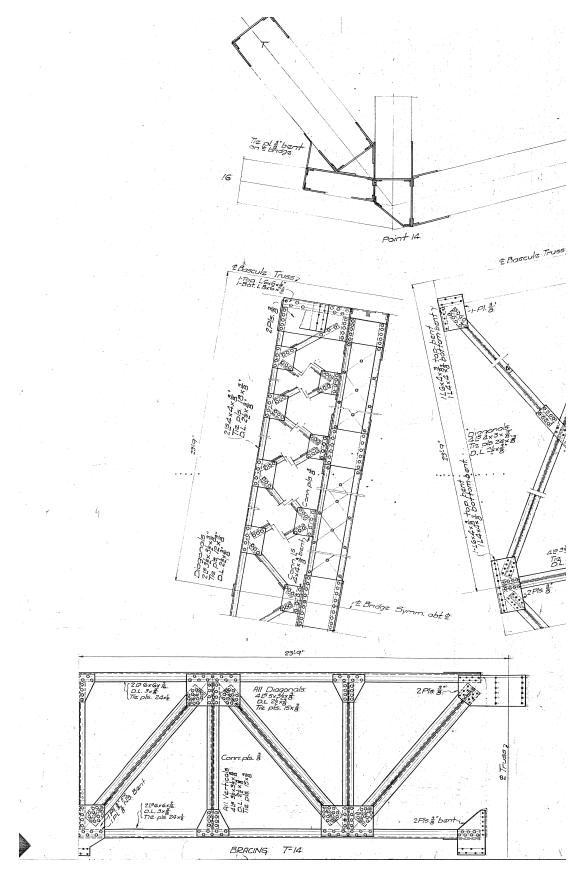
Burnside Bridge Bascule Leaf Transverse Bracing will be weak if Transverse Restraint is added to Bascule Leaf at Point 14
